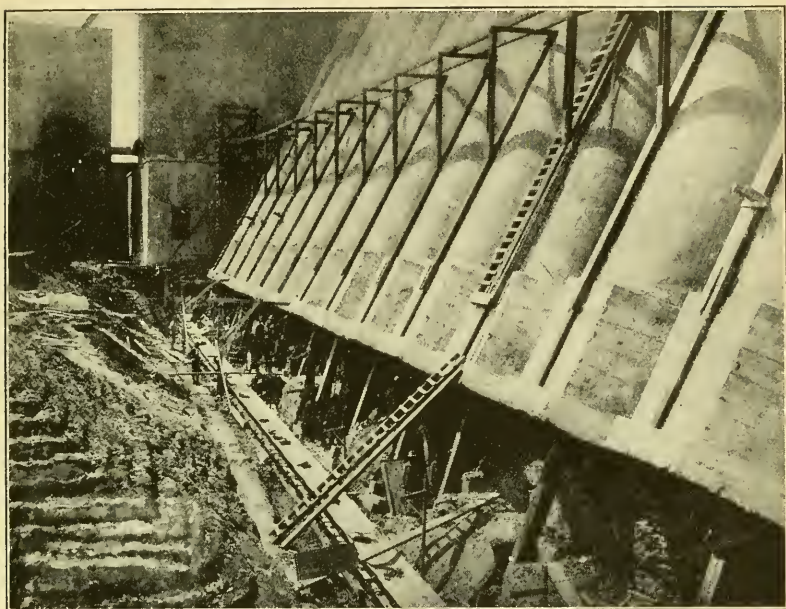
EXCAVATION TOWARD WEST FROM UNDER EAST EDGE OF MAT.
